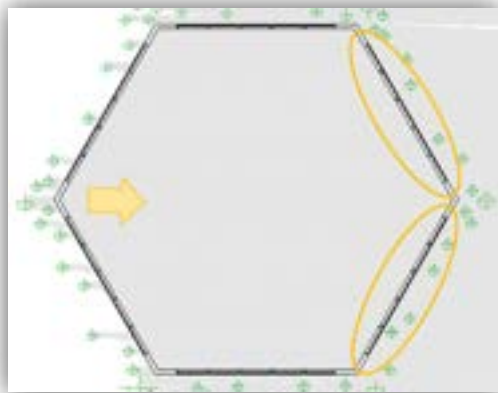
plan view at 9:00 PM (21:00) on an Equinox (March or September) with slab-to-slab windows and two-foot roof overhang. Source: primary.
